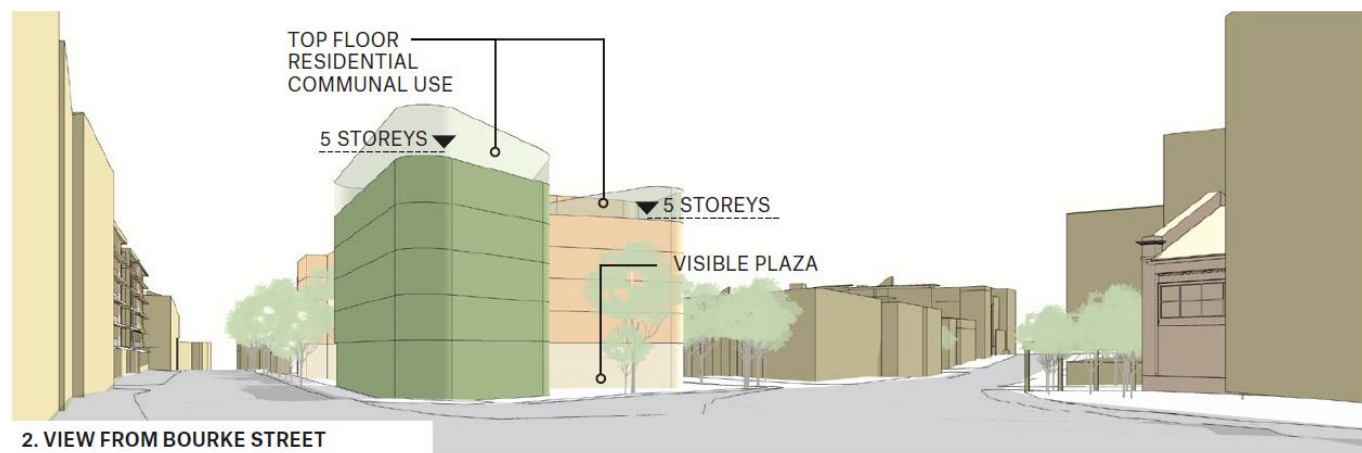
Proposed massing viewed from the Bourke Street and McEvoy Street intersection
